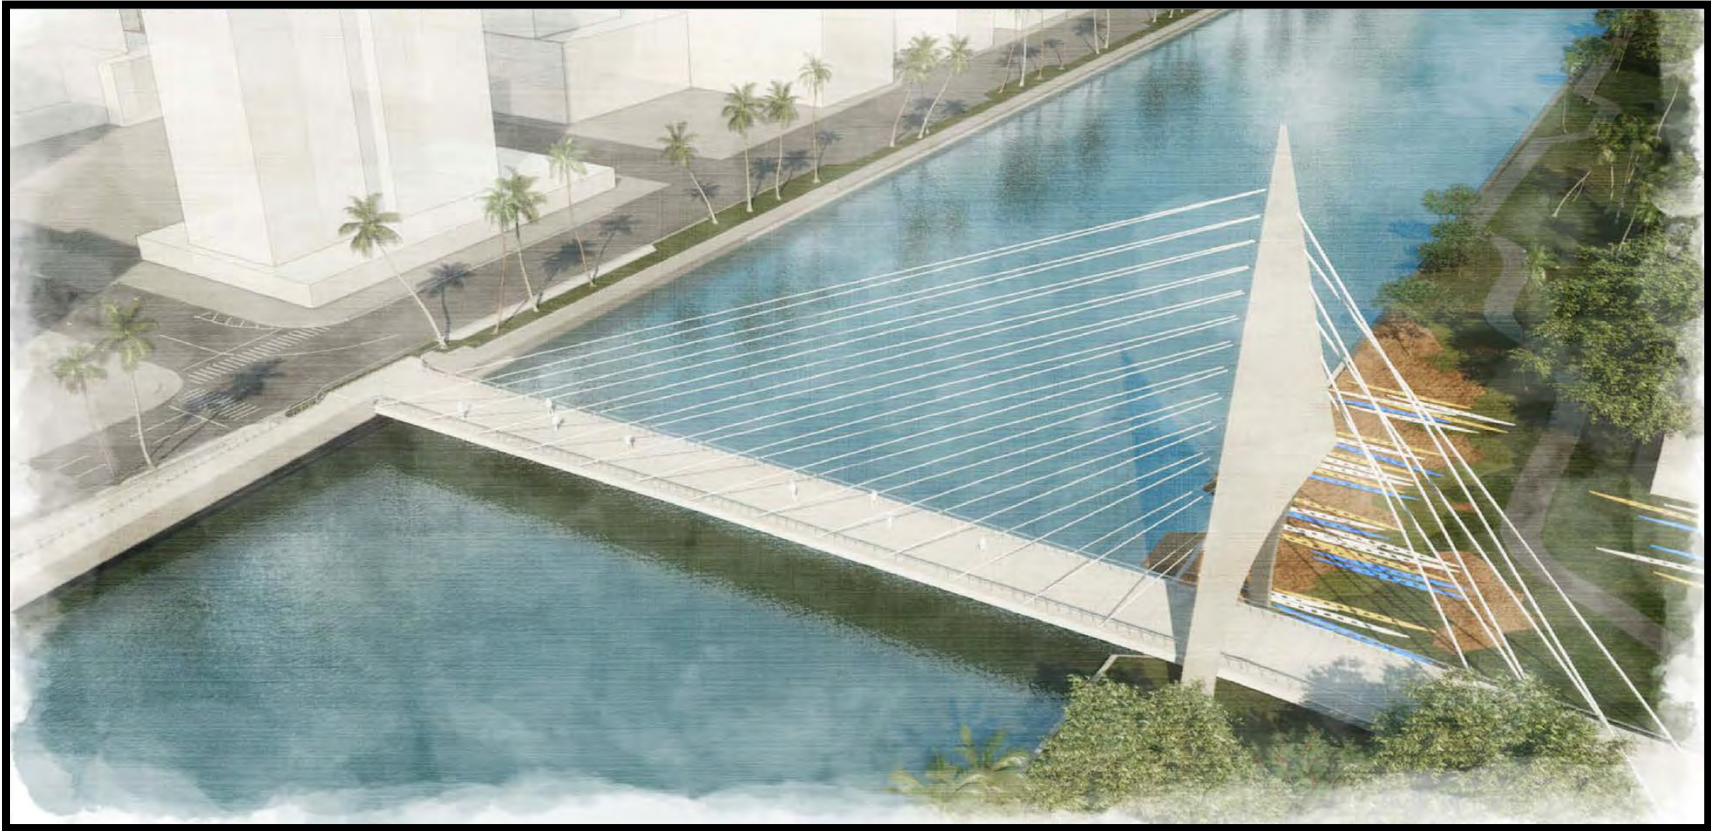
Conceptual site rendering of the Ala Pono Bridge (Courtesy of HDR Inc.)
